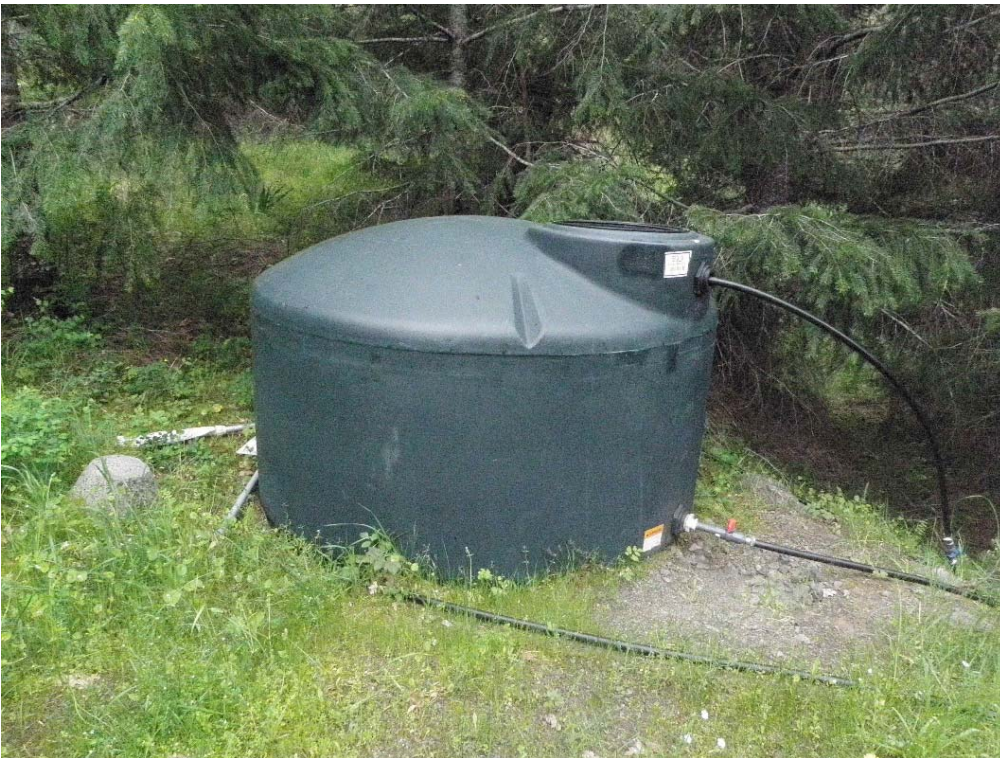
View of leaking 3,000 gal water tank (Photo December 2018).
